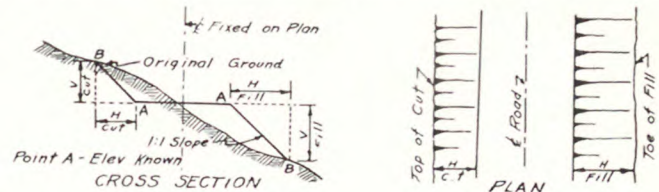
Method of Showing Cuts and Fills on Preliminary Interchange Drawings
